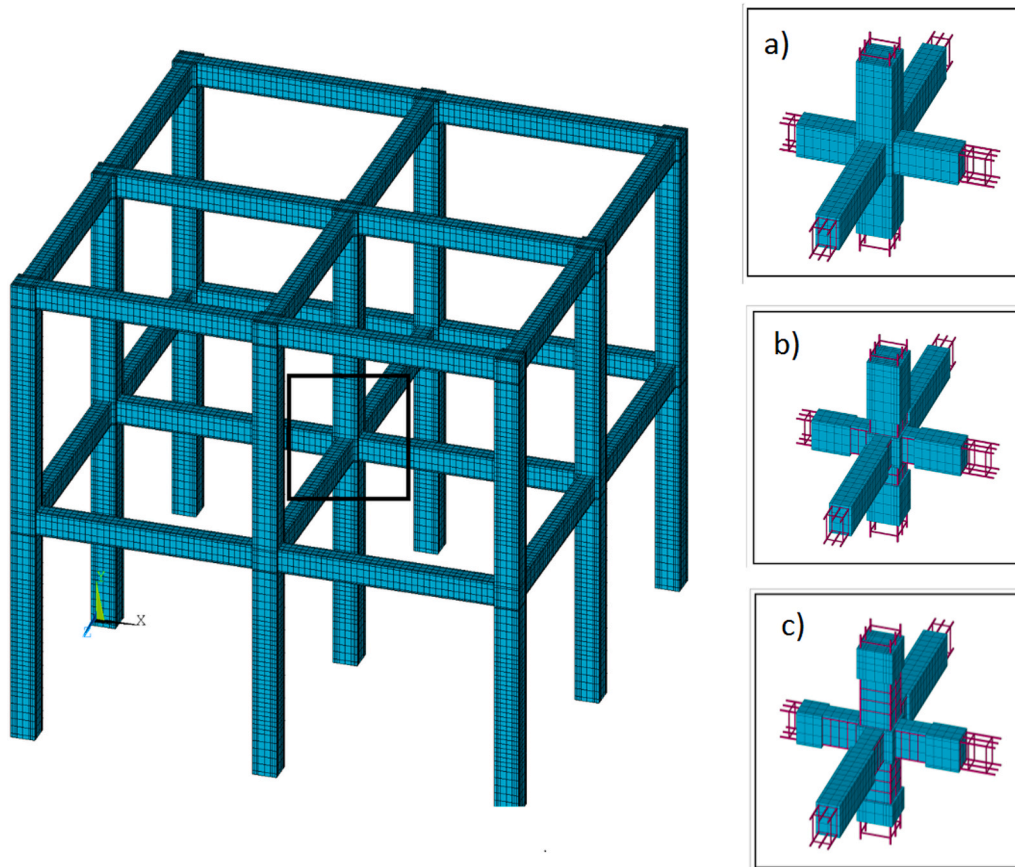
Mesh for concrete and reinforcement elements in the developed finite element model; a) Intact section without damage, b) Damage type A, c) Damage type B.
